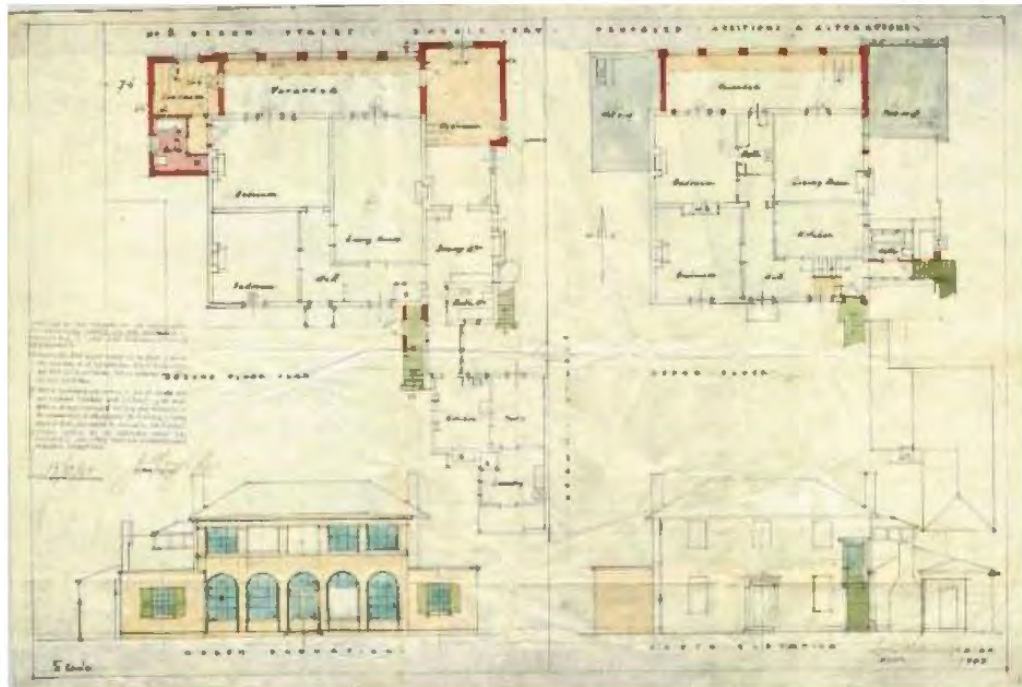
Plans from BA71/1945 (Source: Woollahra Records)
